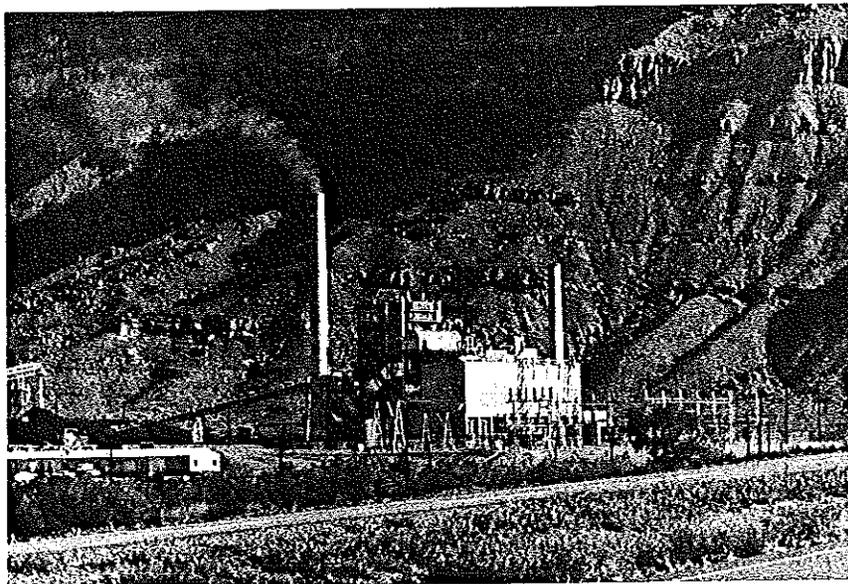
CAMEO PLANT WITH A STRUCTURAL FRAME OF REINFORCED CONCRETE AND STEEL. BOTH STACKS ARE OF REINFORCED CONCRETE. ONE STACK IS 150 FEET AND THE OTHER IS 200 FEET HIGH.
